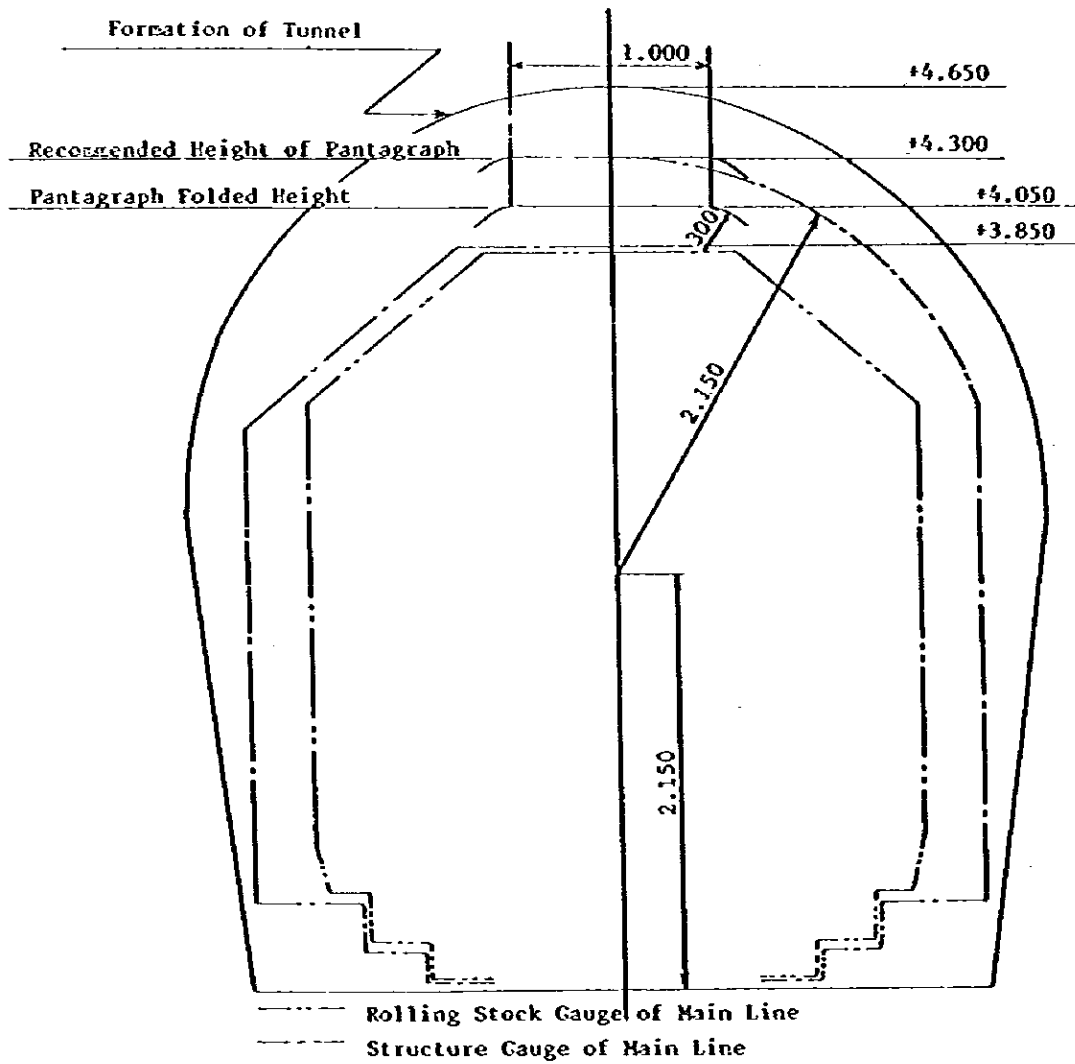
Enlarged construction gage in alternating current electrification.
